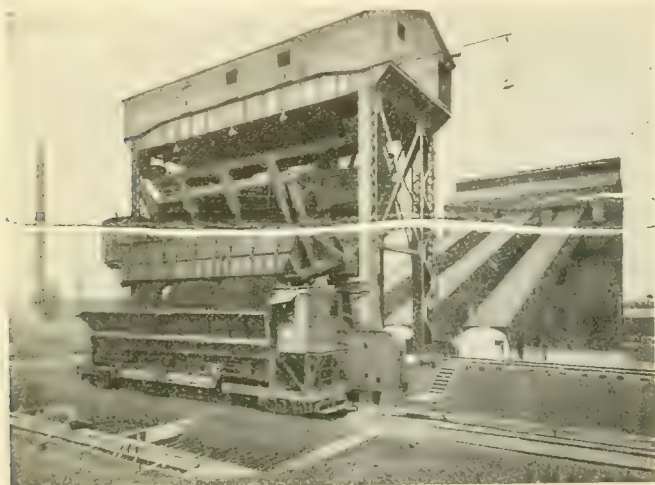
CAR DUMPER AND COAL HANDLING EQUIPMENT
